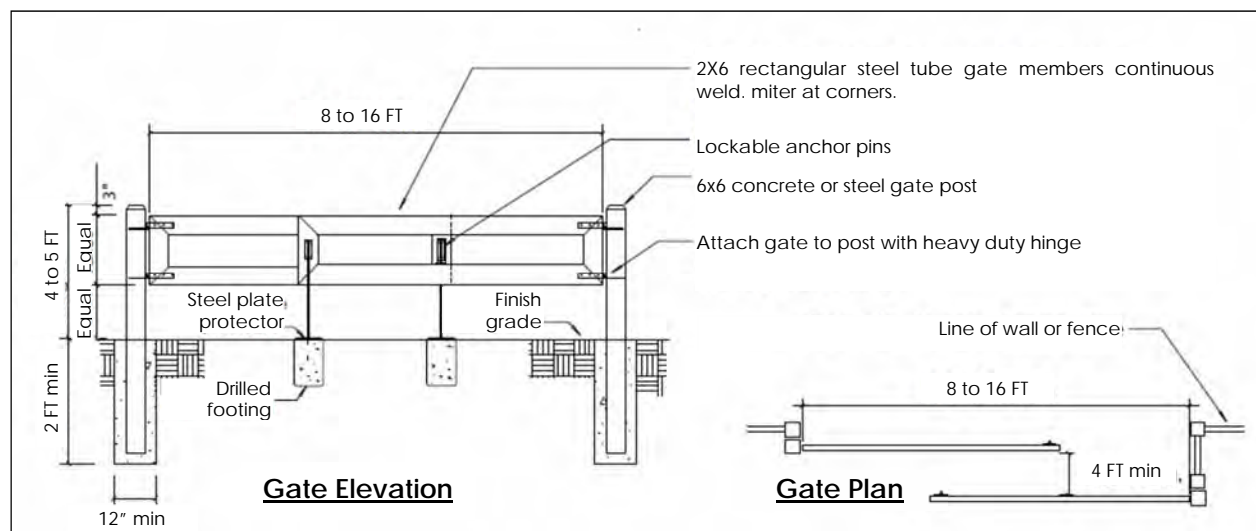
Equestrian Trail Steel Barrier Gate Entry Design
